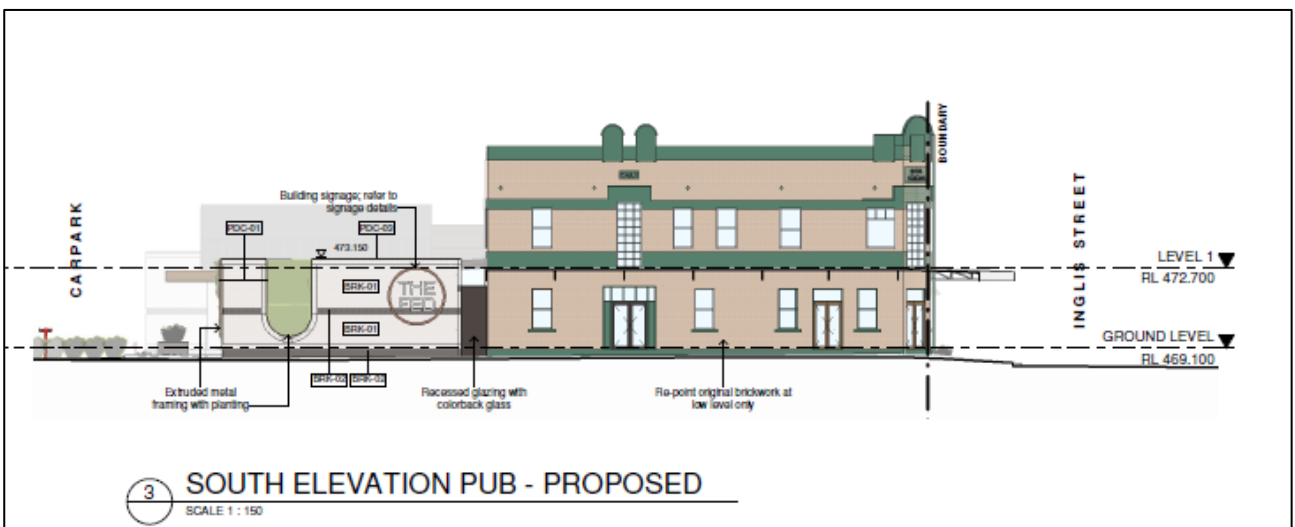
Elevation Plan - Federal Additions (Inglis Street Elevation)
